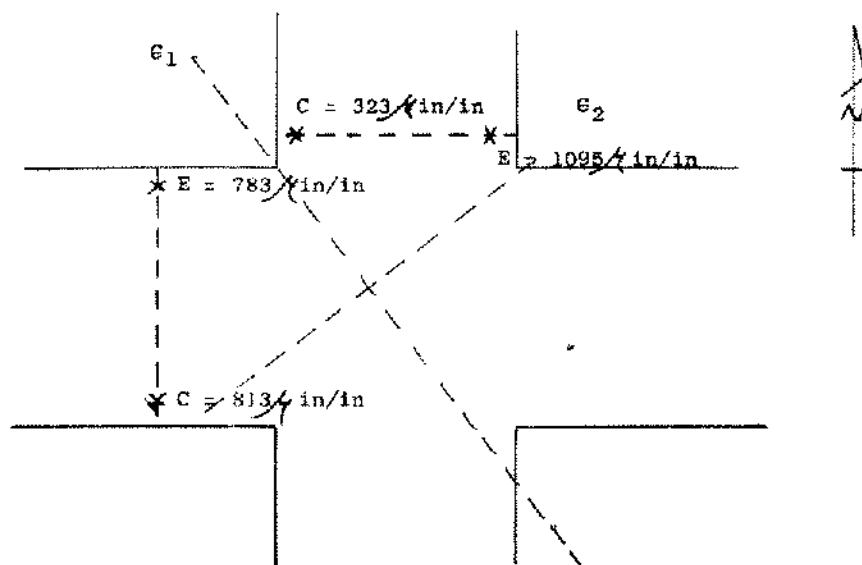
Typical Instrument Locations -- Plan View of Workings.
